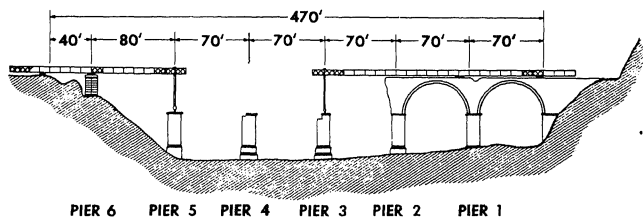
Piers 3 and 5 constructed from ends of bridge cantilevered out from each bank.
